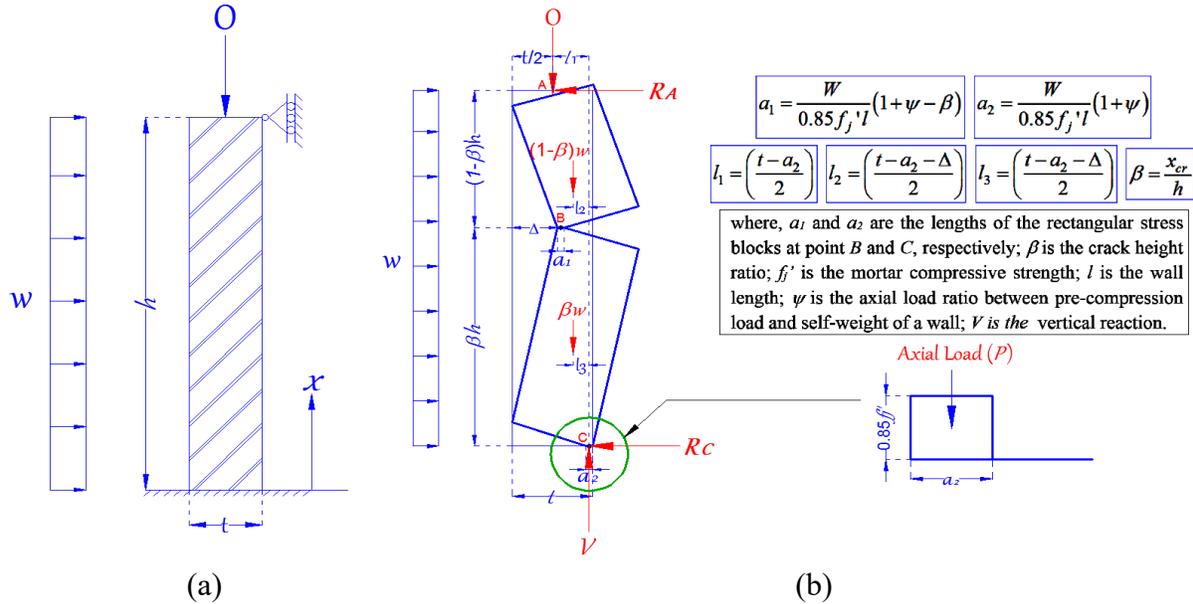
(a) Wall Cross-Section Subjected to Out-of-Plane Force; (b) Deformed Shape and Reactions on URM Rigid Wall with Stress Block Parameters (Derakhshan et al. 2013)
